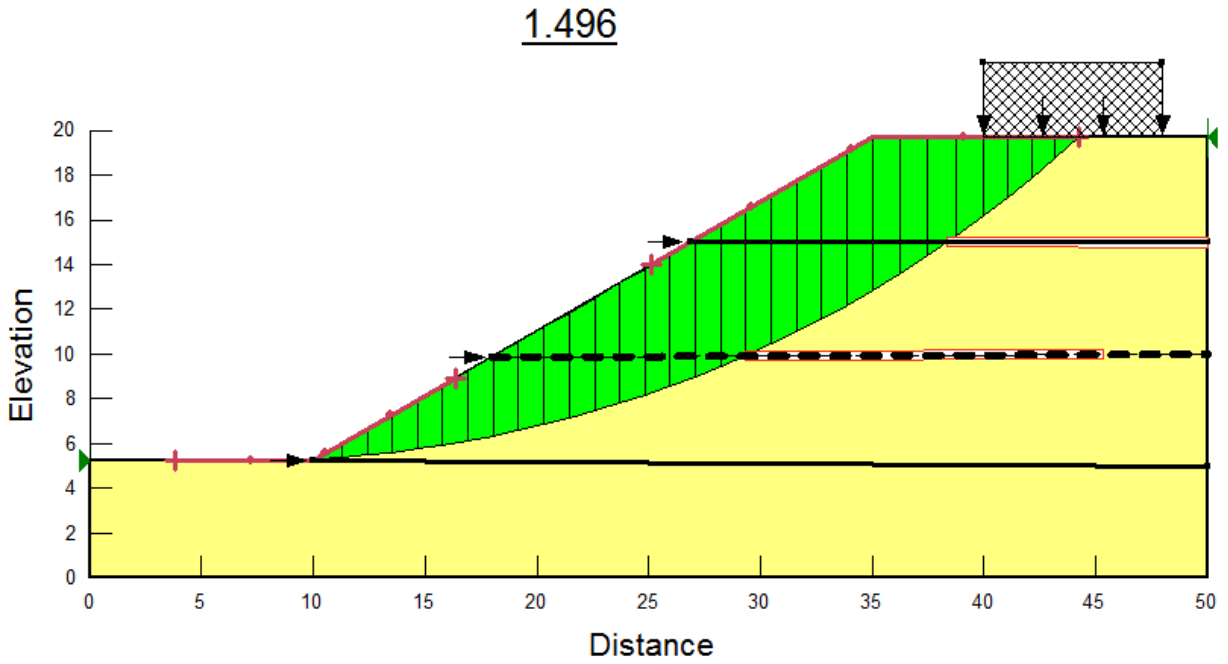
Reinforced slope with 30 KN/m<sup>3</sup> surcharge
